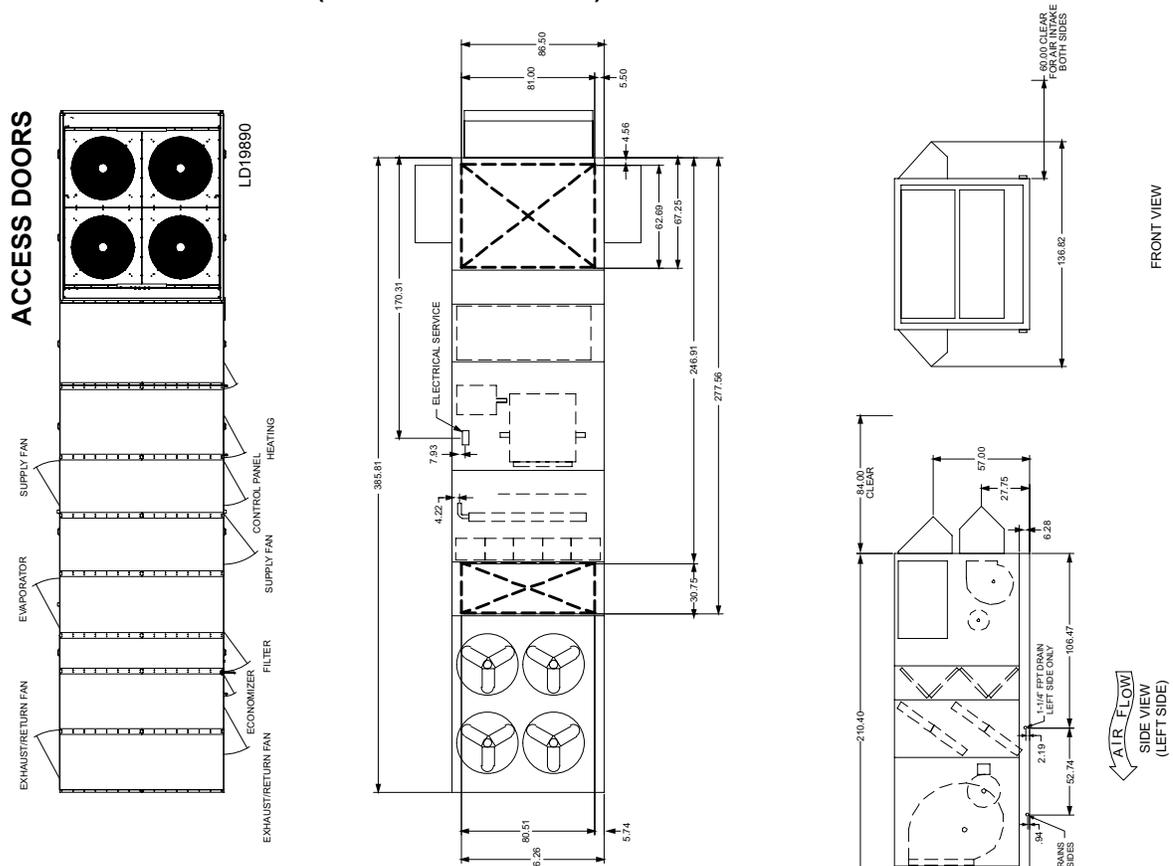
GENERAL ARRANGEMENT DRAWING
